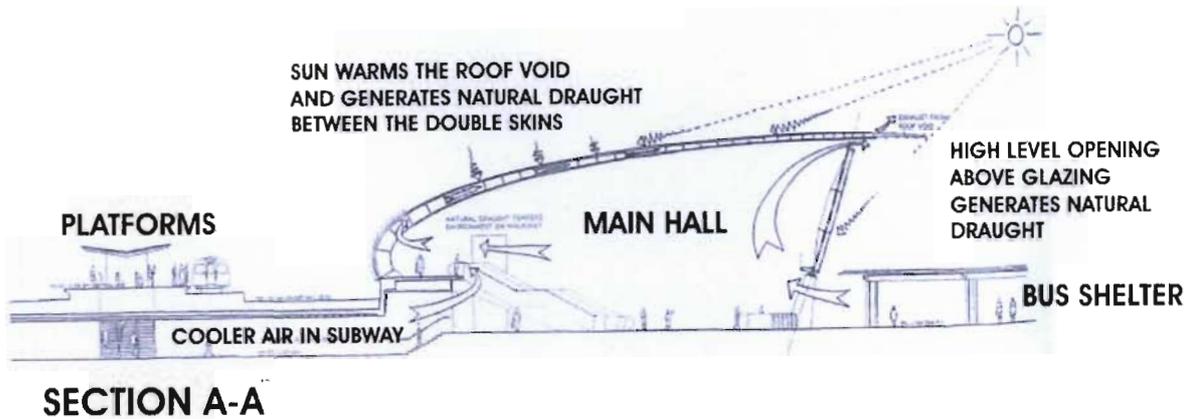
A cross-section demonstrating the ventilation technique of the Stratford Station building, which is through convection cooling. This drawing also shows the different roof forms of the Platforms, Main Hall and Bus shelter, within the same precinct. (Davey, 1999: 59)
